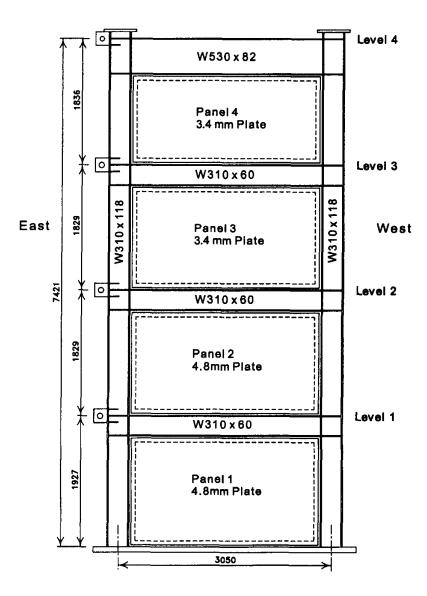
Schematic of Test Specimen-North Elevation (Driver et al. 1997)
